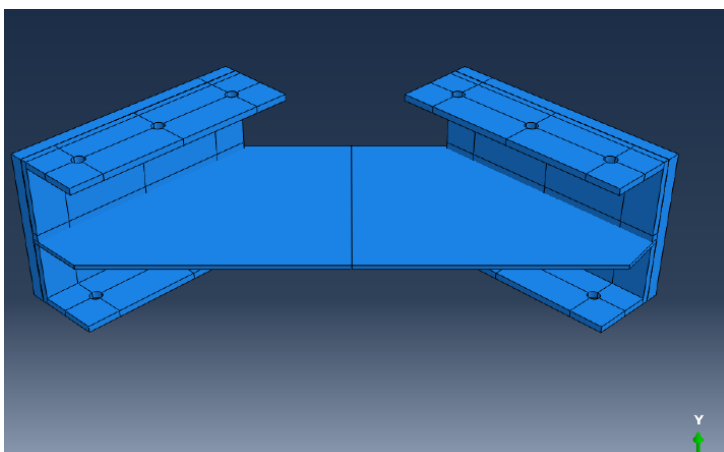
Single Plate 8 mm tk. Welded Haunch
